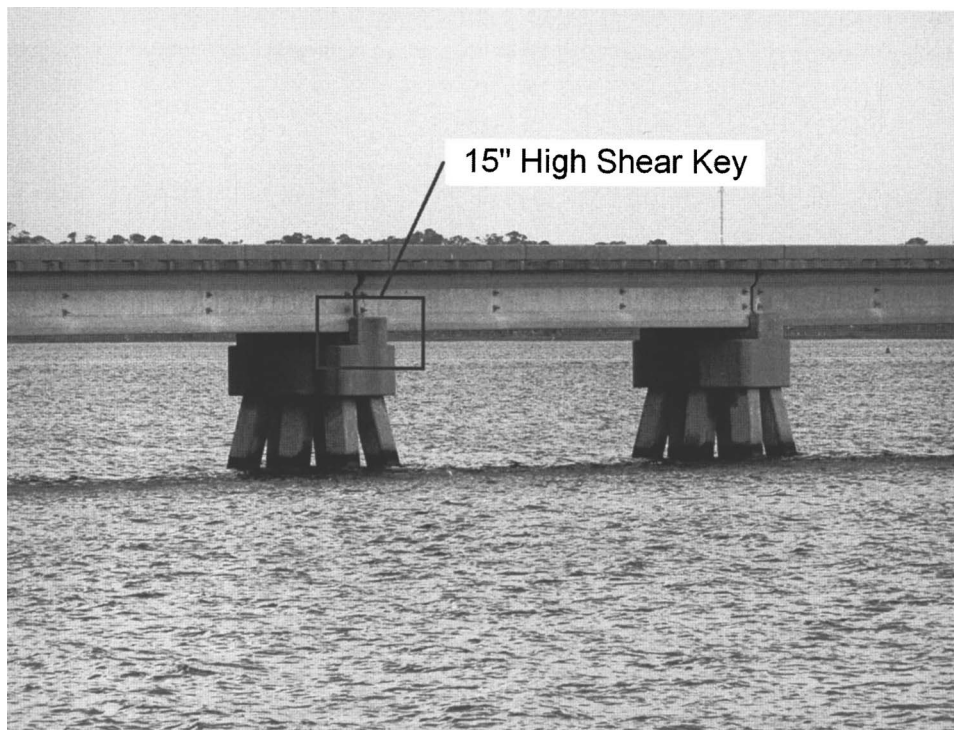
Railroad bridge over Biloxi Bay with close-spaced girders and large concrete shear keys (1 in.=25.4 mm)
